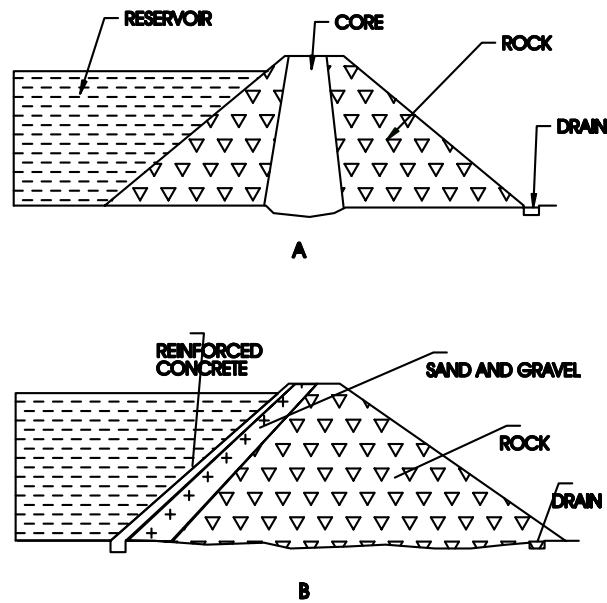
Idealized section of embankment dams a) Rock-fill dam with symmetrical clay core b) Rock and gravel dam with reinforced concrete slab
